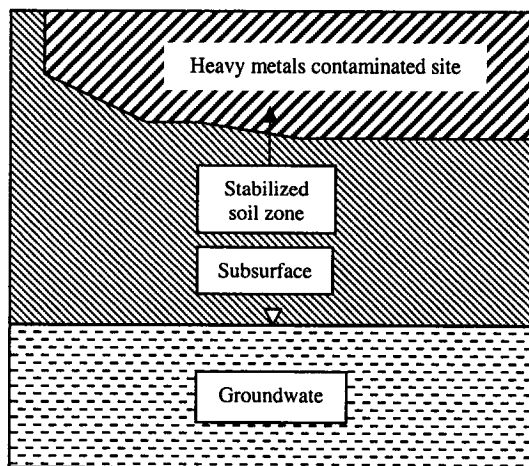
Application of grouted stabilization for contaminated site (cross-section)
